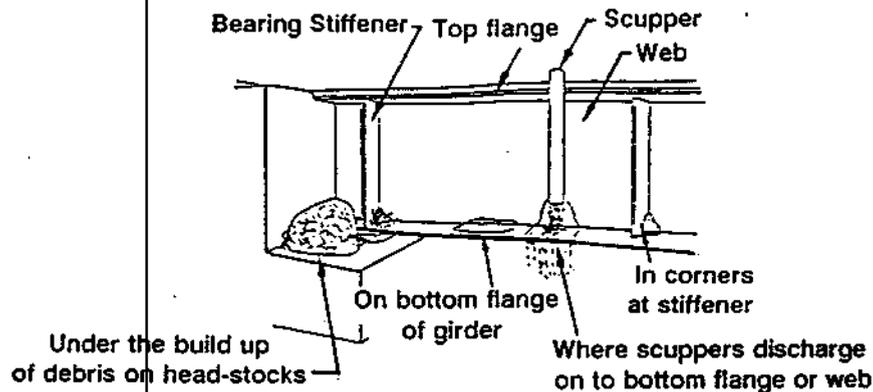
Common Locations of Corrosion in Steel Girder Bridges
